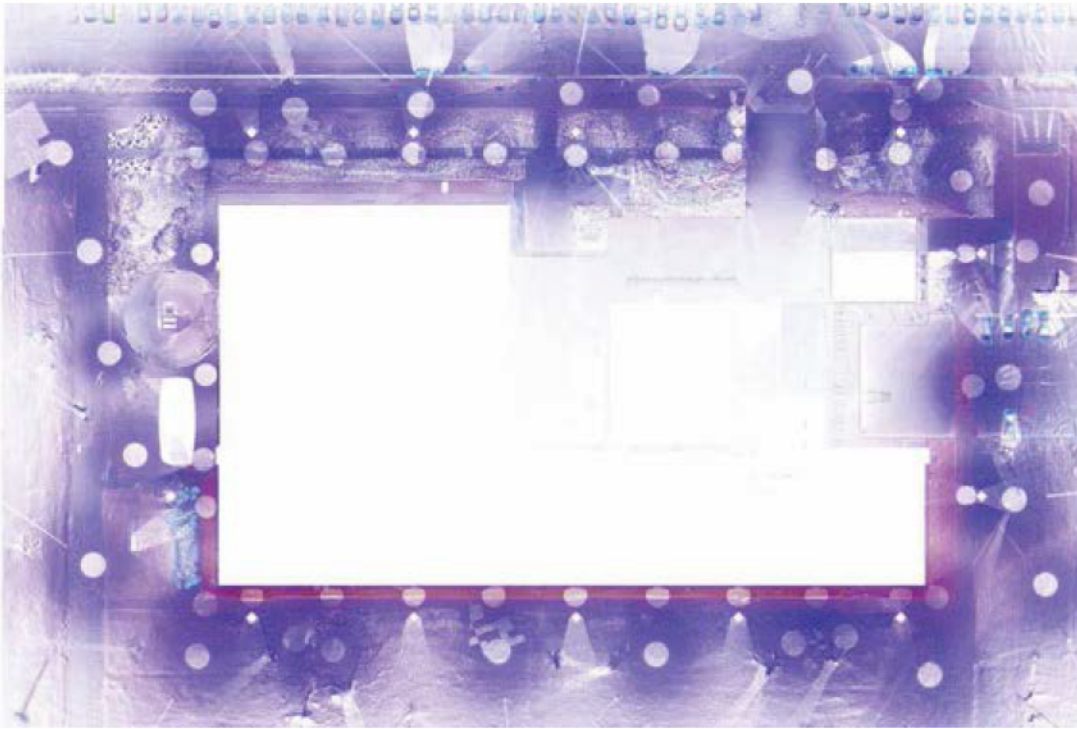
FAU USP building, position of external scan stations of the 3D survey.
